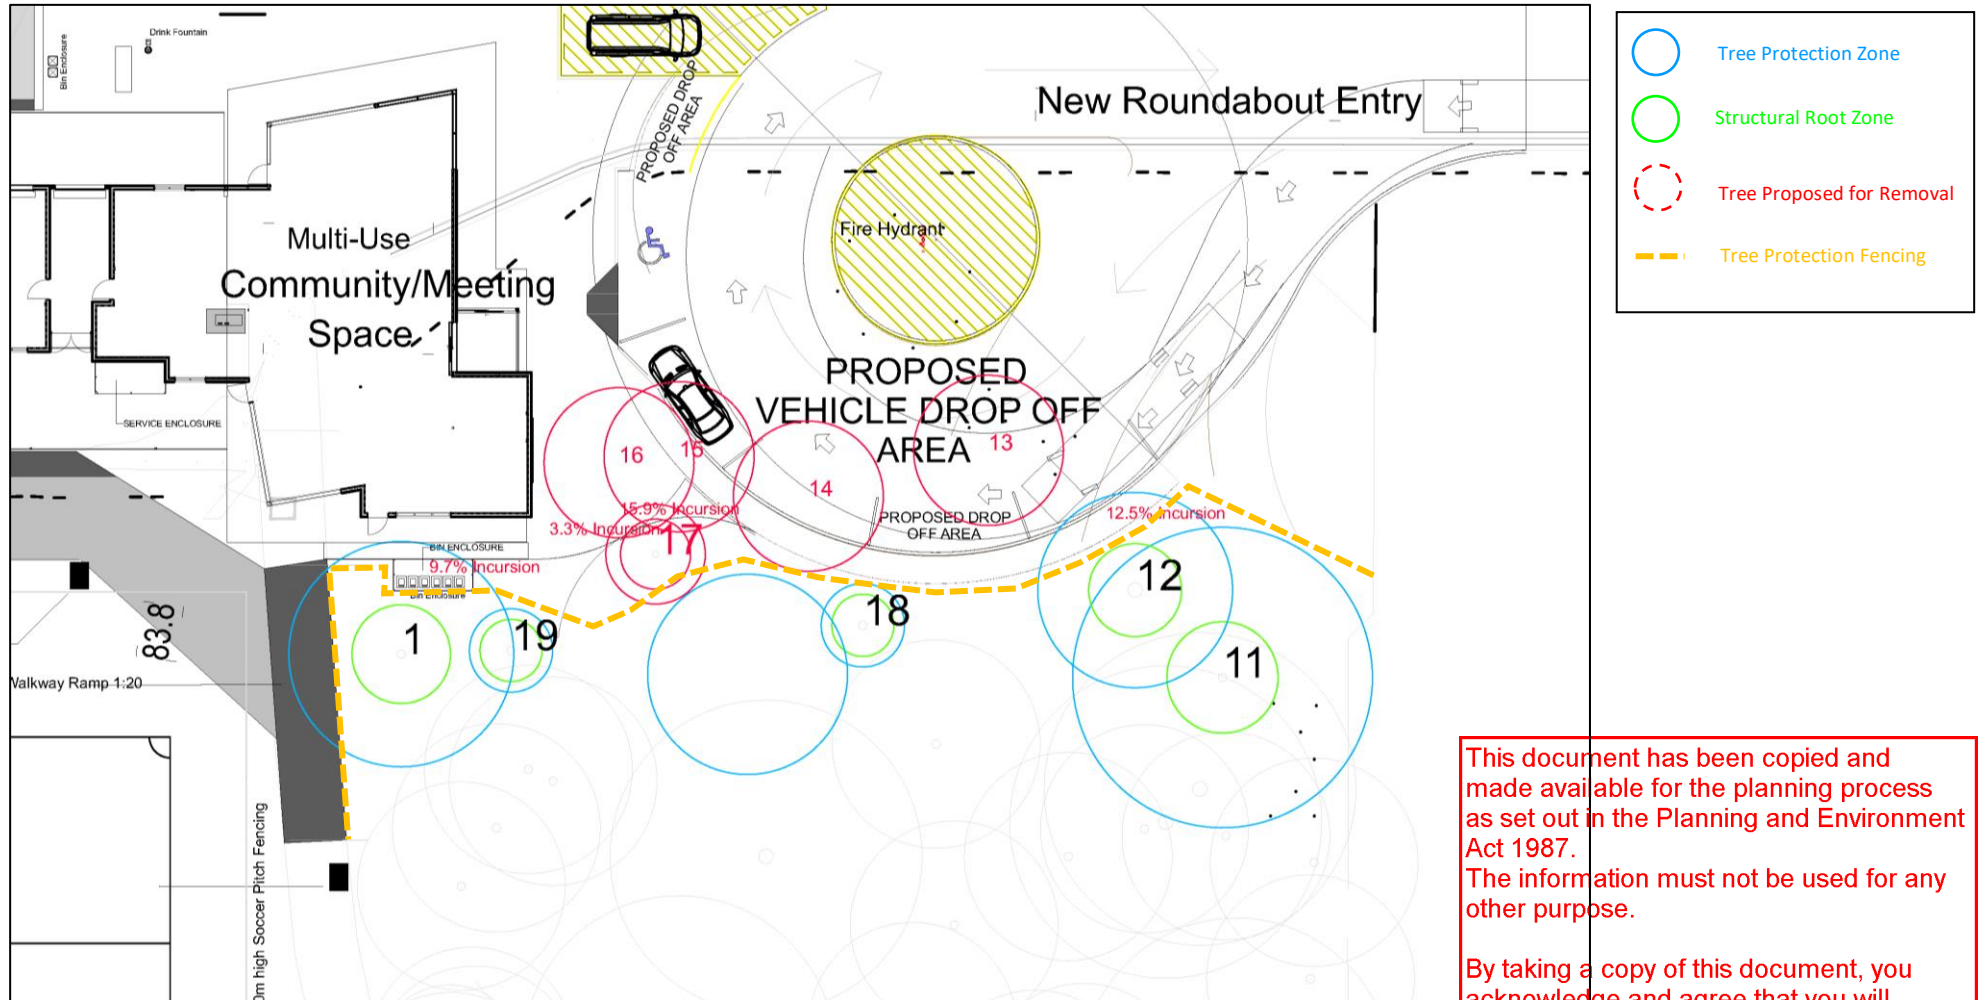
Site Plan (JCC Design) with tree protection zones drawn to scale (M. Sorenson)
